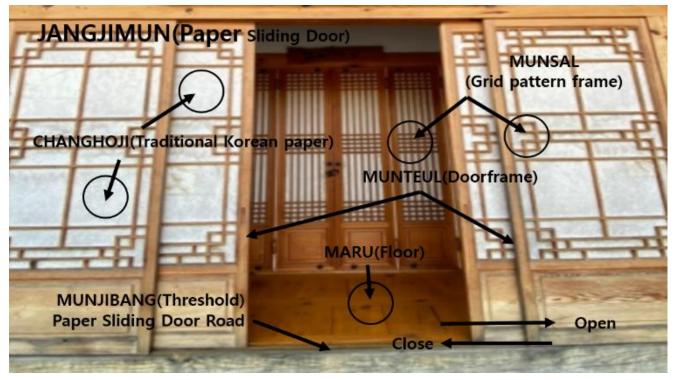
JANGJIMUN(Room door of Traditional Korean House)
